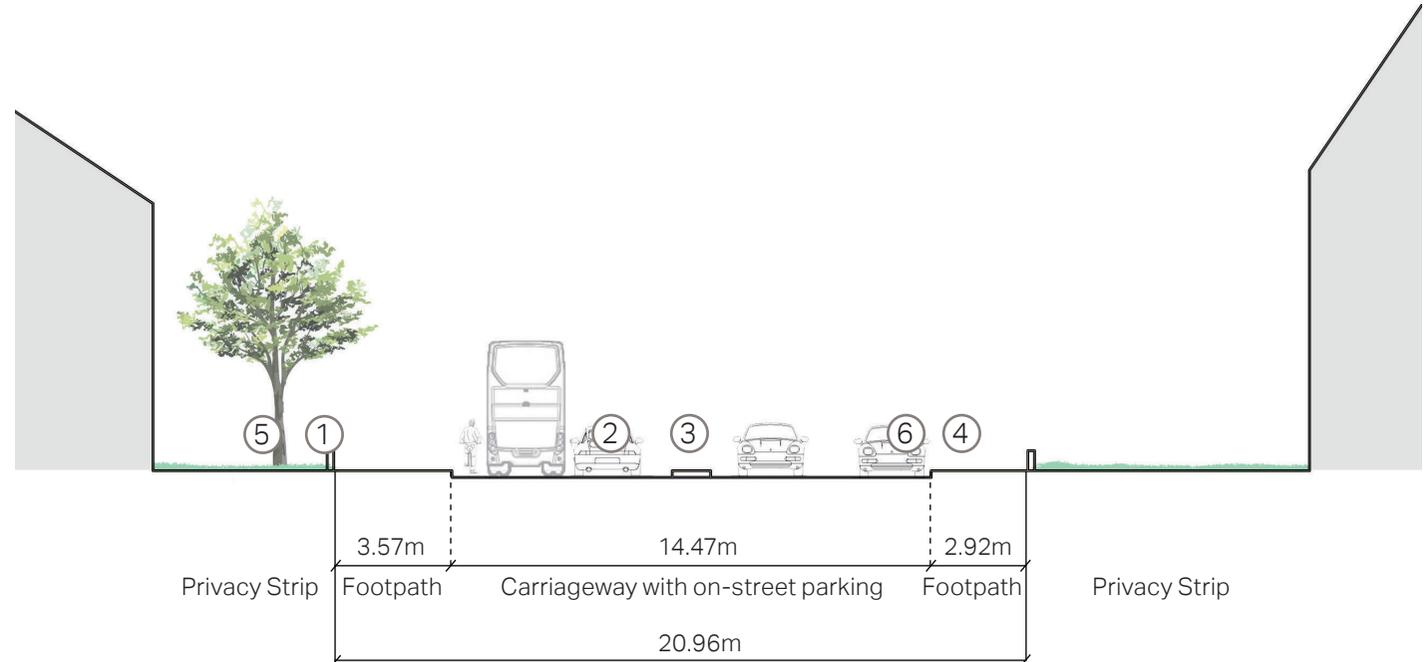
Cross-section showing the dimensions for a section of the existing Barrack Road.
